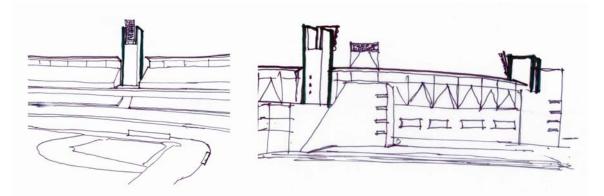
Light towers as civic markers at Petco Park (Source: Author)
